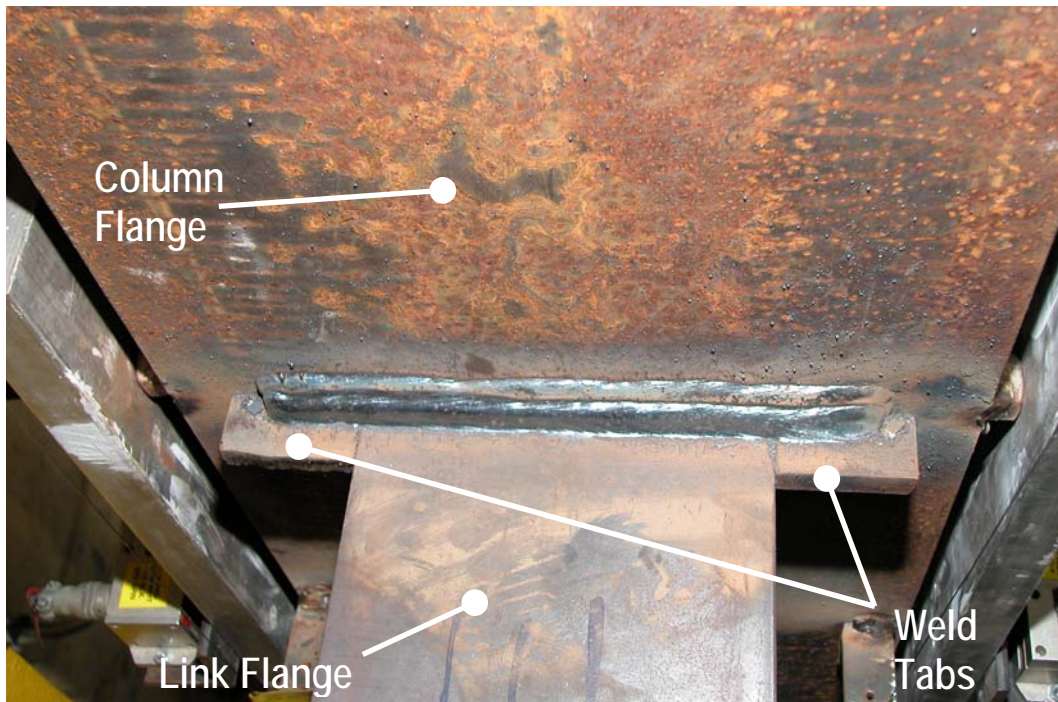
Link top flange welding detail for Specimens AISC 1 to 3
